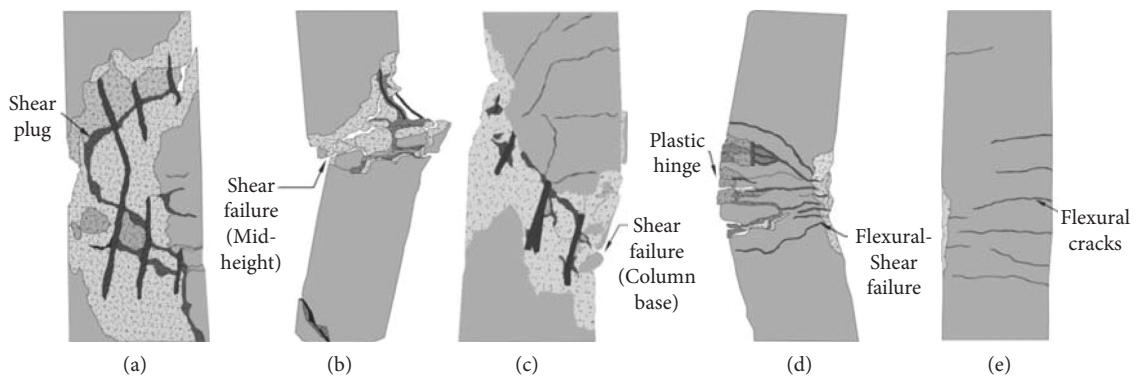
Typical failure modes of RC bridge column under impact load [6]: (a) punching shear; (b) shear hinge; (c) diagonal shear failure; (d) combined flexural-shear failure; (e) flexural failure.
